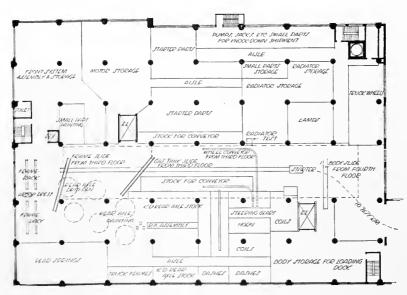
Second Floor, Building for Ford Motor Company, Chicago, Ill.
